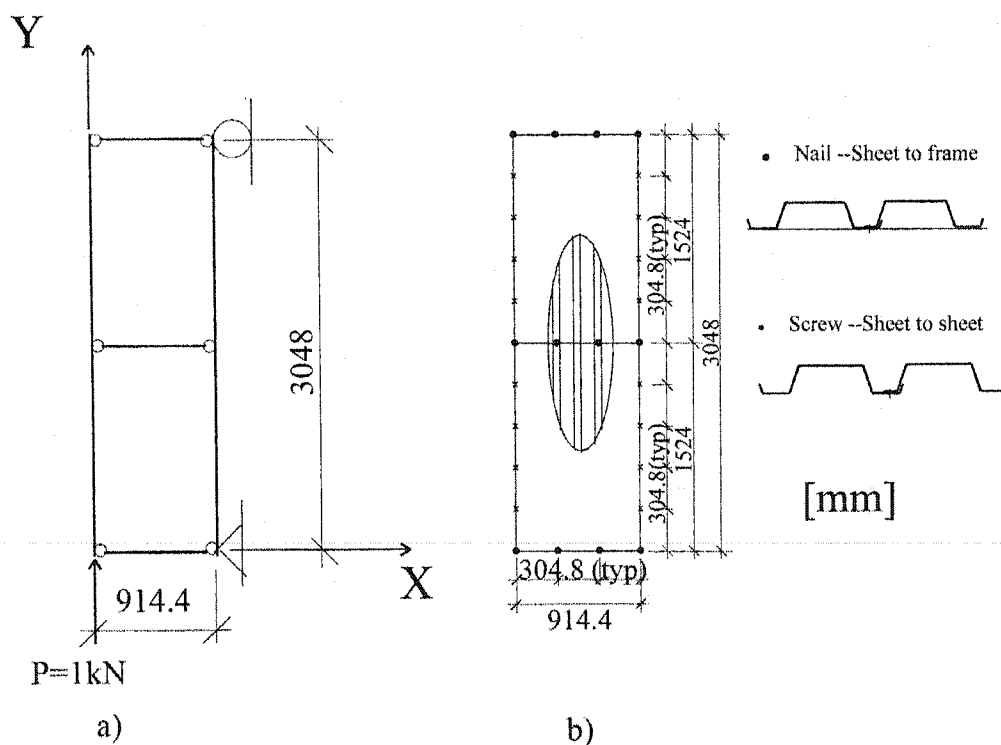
Cantilever analysis model, a) Frame & joists; b) Sheet layout
